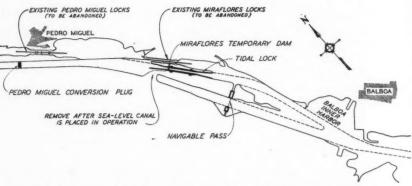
Location Plan, Pedro Miguel Plug and Miraflores Temporary Dam
